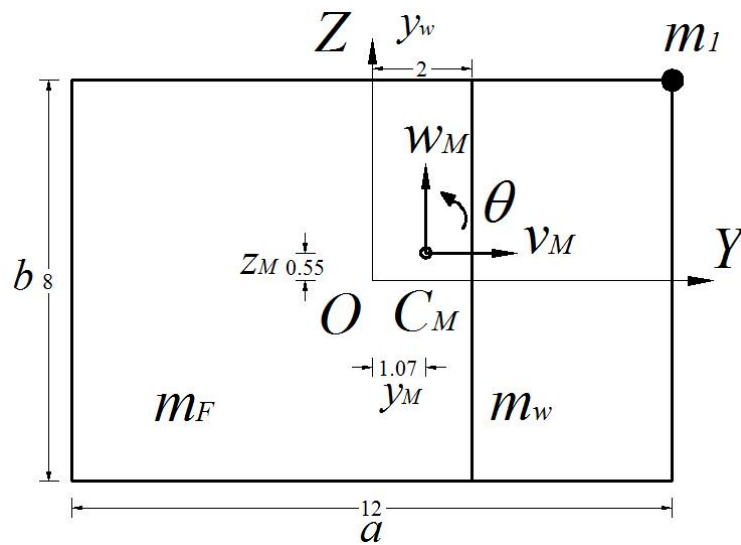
Scaled plan of asymmetric building, dimensions in meter.
